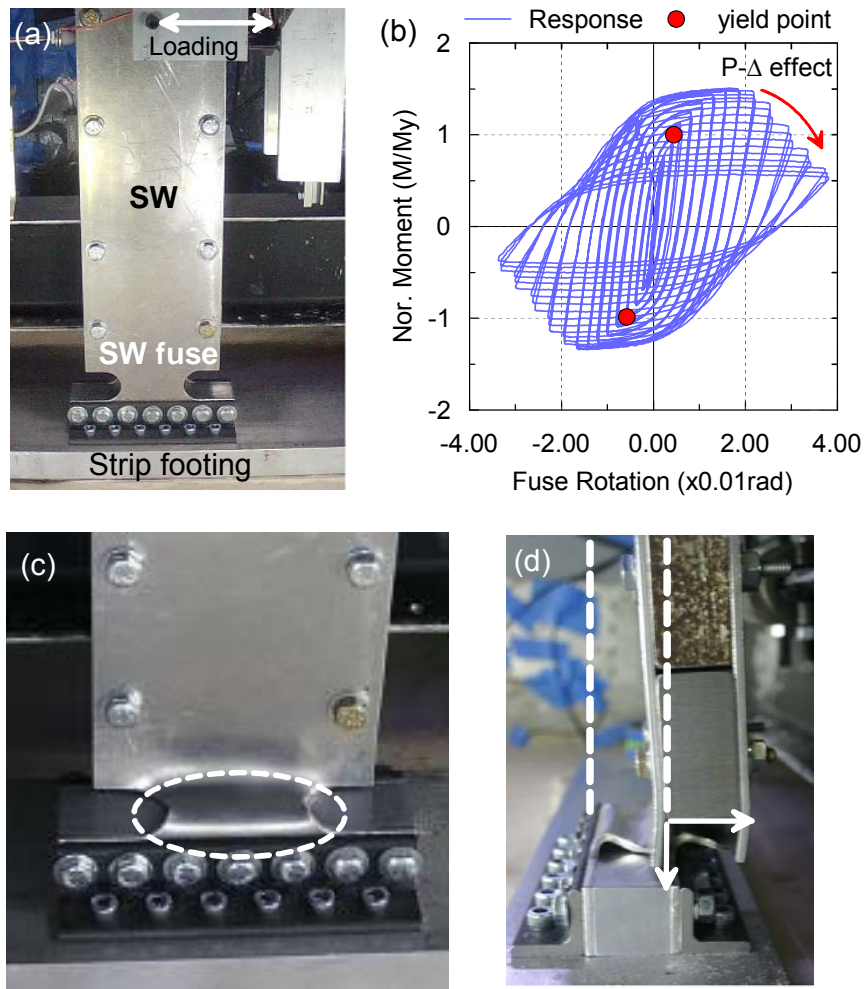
Characterization of the shear wall fuse at 30-g: (a) test setup; (b) test result; (c) photograph at failure (elevation view); (d) photograph at failure (side view)
